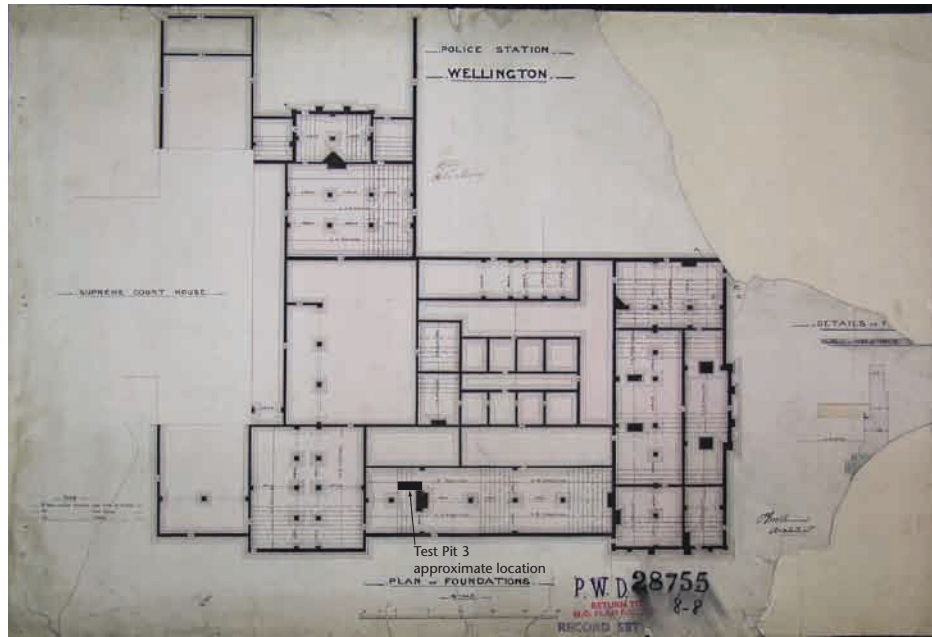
Approximate location of Test Pit 3, overlain on the 1880 Public Works Department foundation plan of the Armed Constabulary Police Station.
